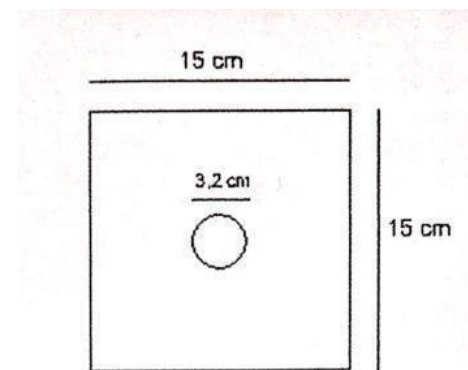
Top view of foundation plate with reinforced single column of 3.2 cm diameter.
